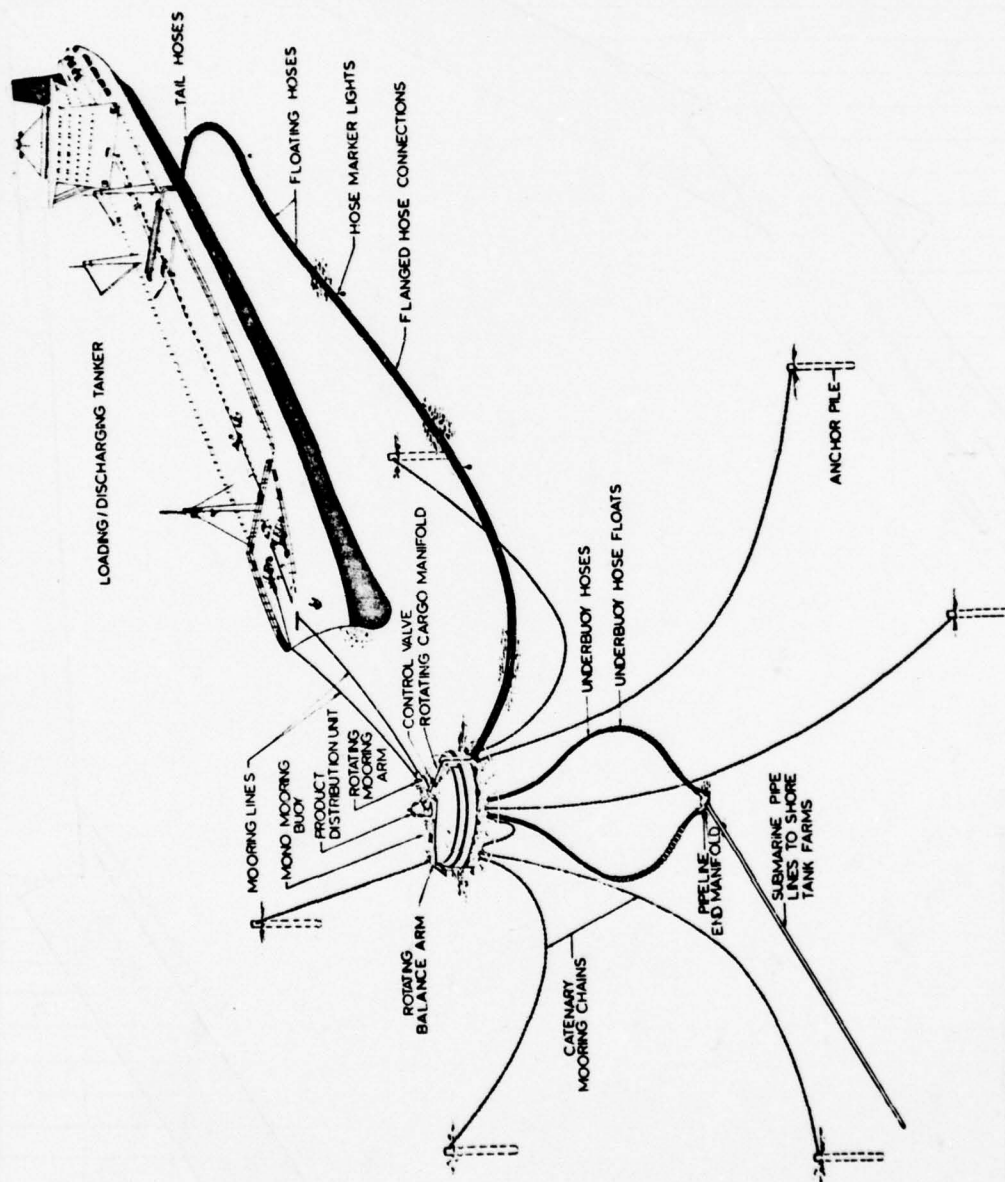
General Arrangement of Catenary Anchor Leg Mooring
